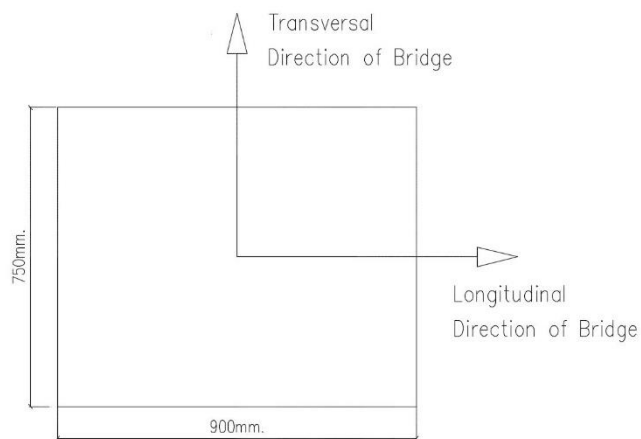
Elastomeric Expansion Bearing used in EBC3 (Top View)
